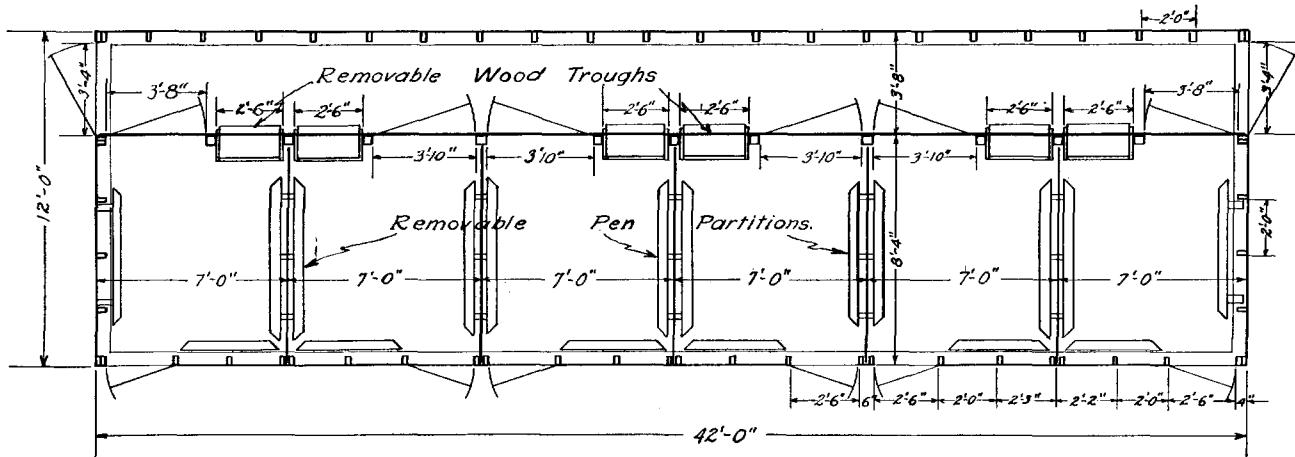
Floor plan of single-row farrowing house. The feed alley is along the north wall, giving all pens south exposure.
